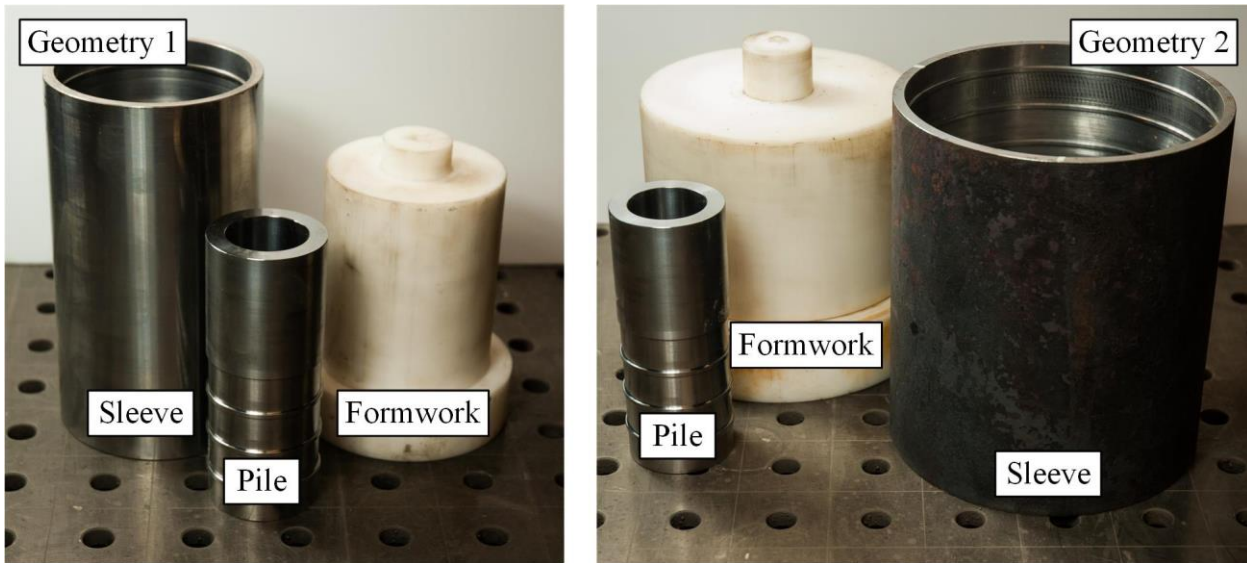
Blank steel pieces and formwork of the two specimen geometries
